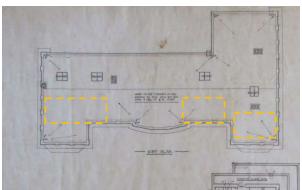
Location of subject wall recess at first-floor level as shown (circled) on the original first-floor plan.
